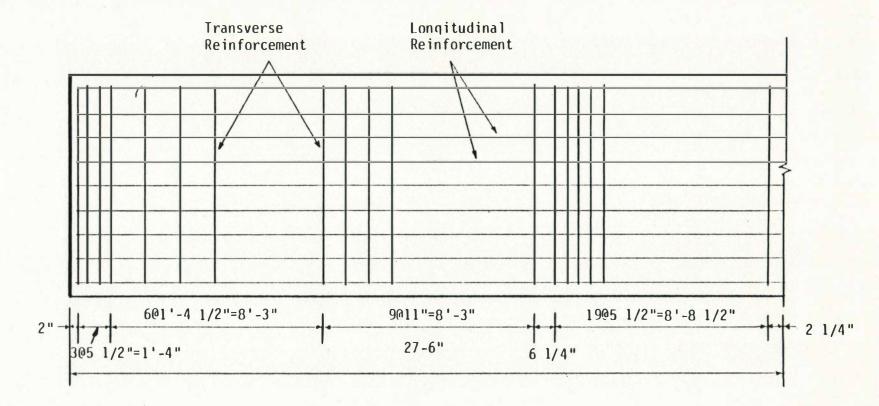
Bridge Unit Slab Reinforcement Layout
